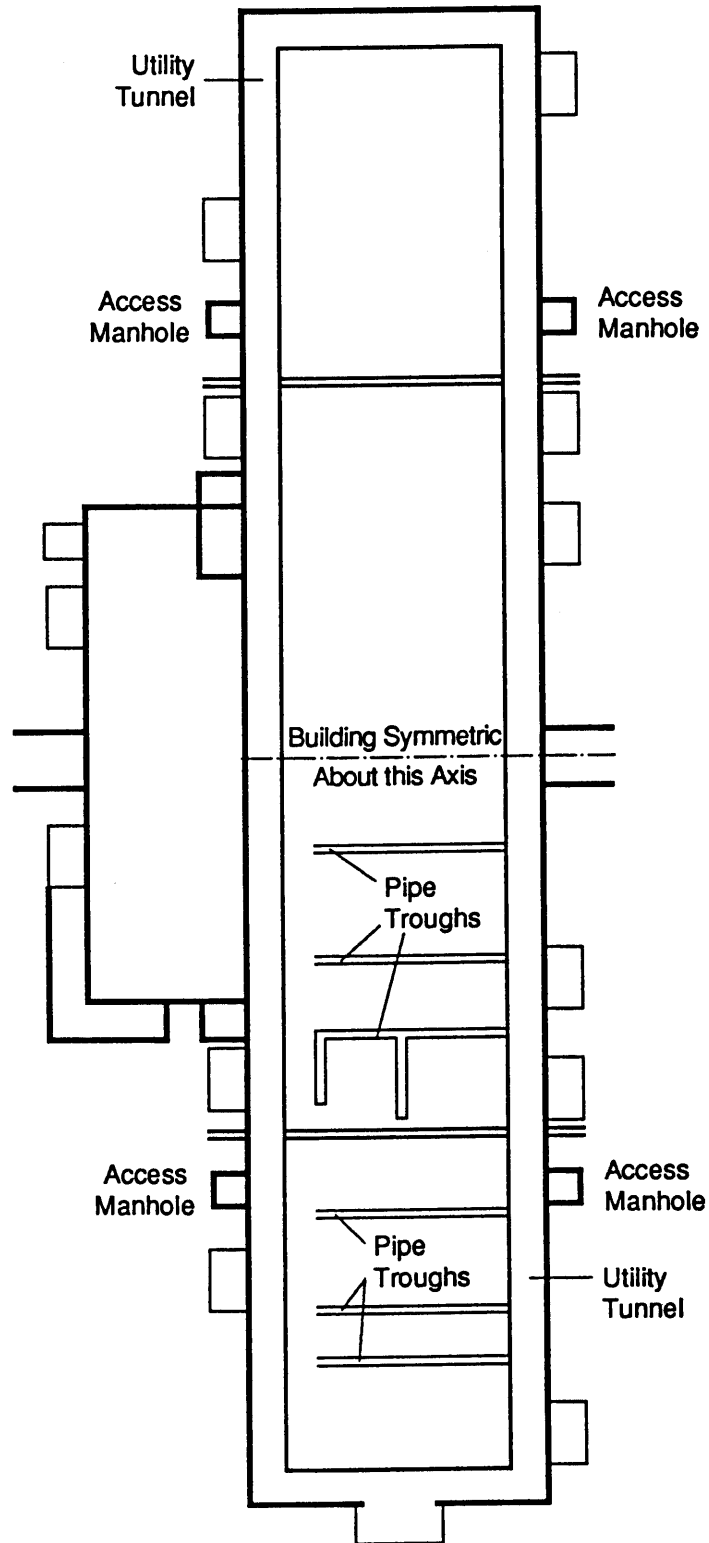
Foundation plan for Building 3. (LASL 1945c)
